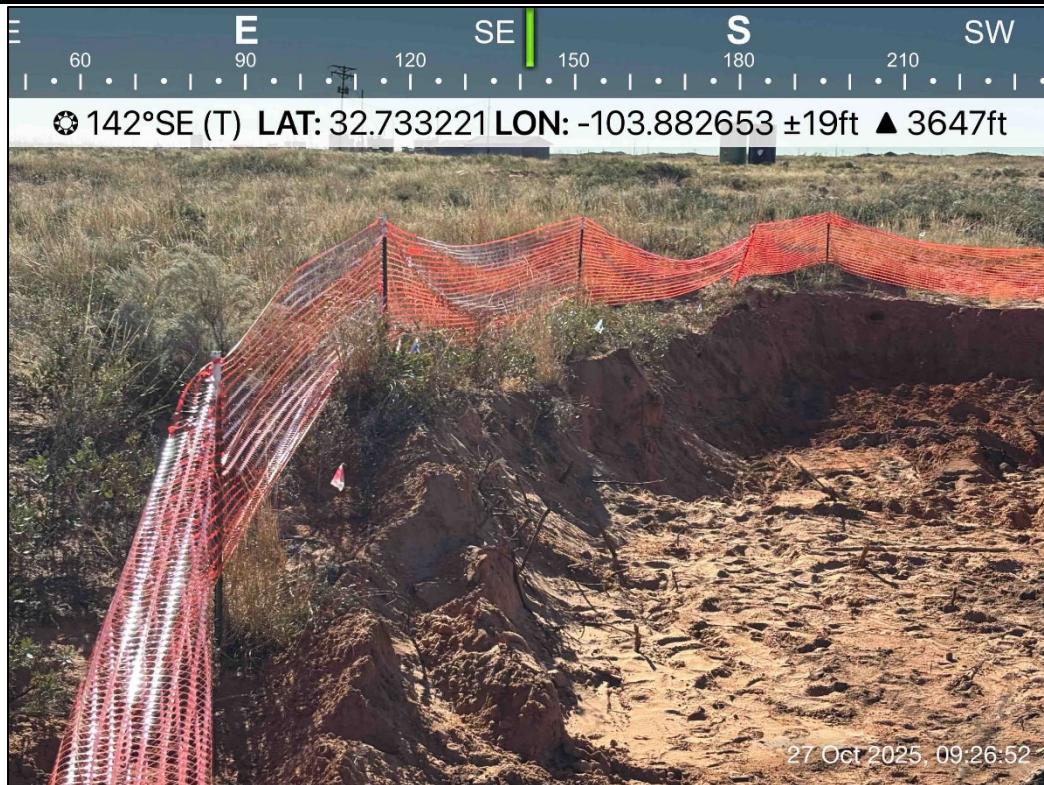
Southeastern view of excavation extent. 10/27/2025
